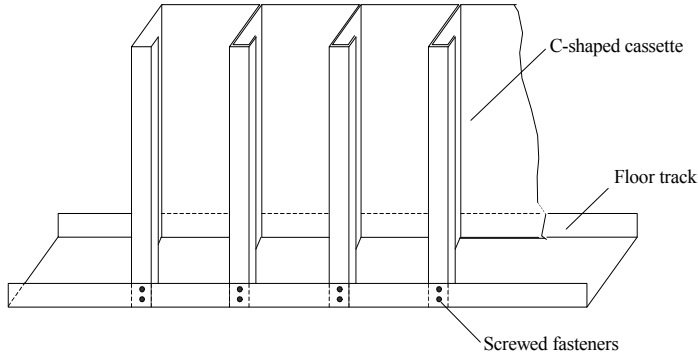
Cassettes spanning vertically in a wall panel (Davies, 2005)
